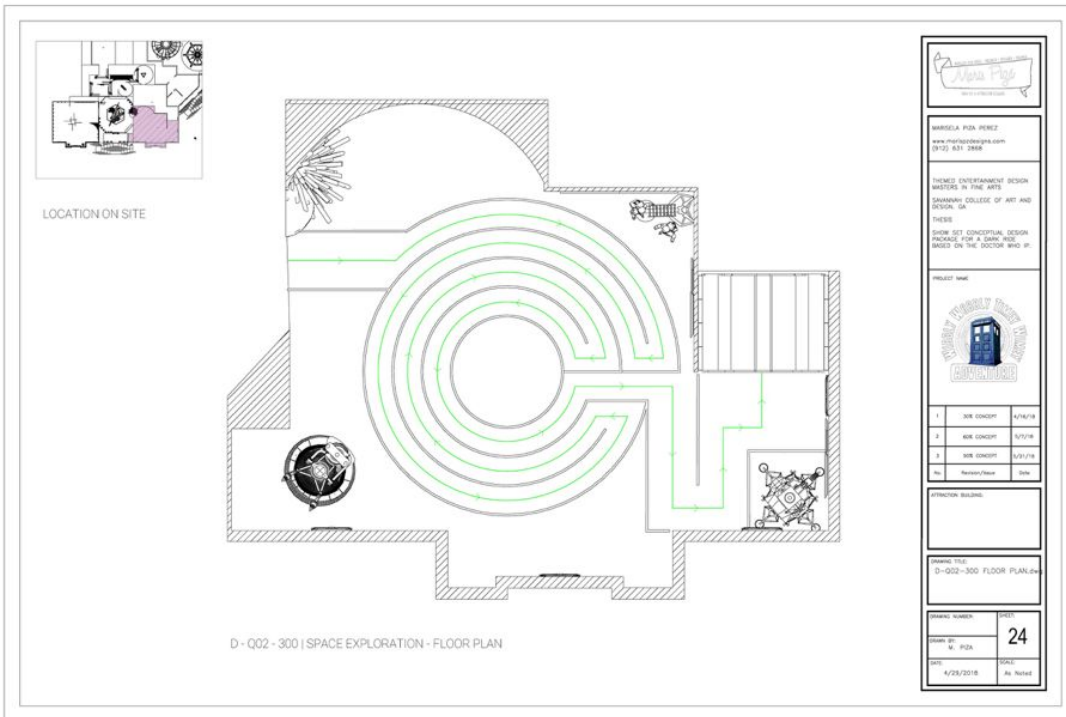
D-Q02-300 |Space Explorations - Floor Plan
